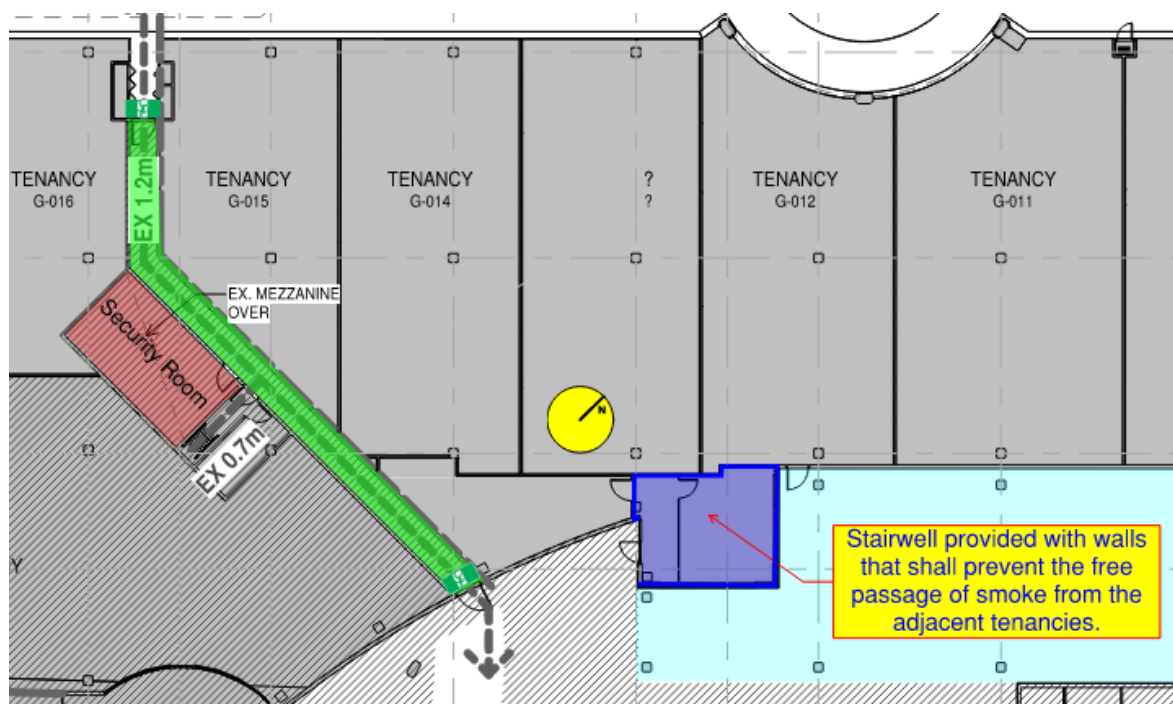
Walls that shall prevent the free passage of smoke on Ground Floor
